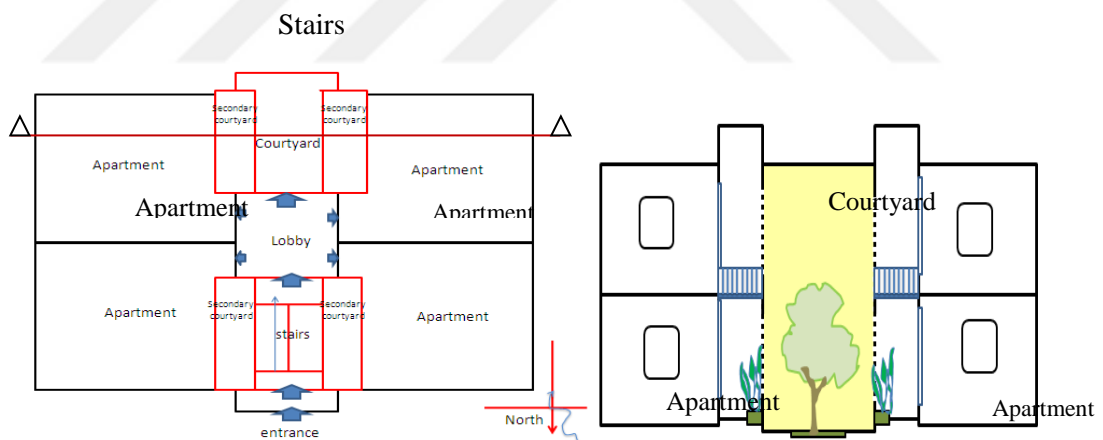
Plan of the design solution –section in the courtyard .The building was analyzed according to ventilation, cooling, heating, lighting, privacy and safety, as shown here.
